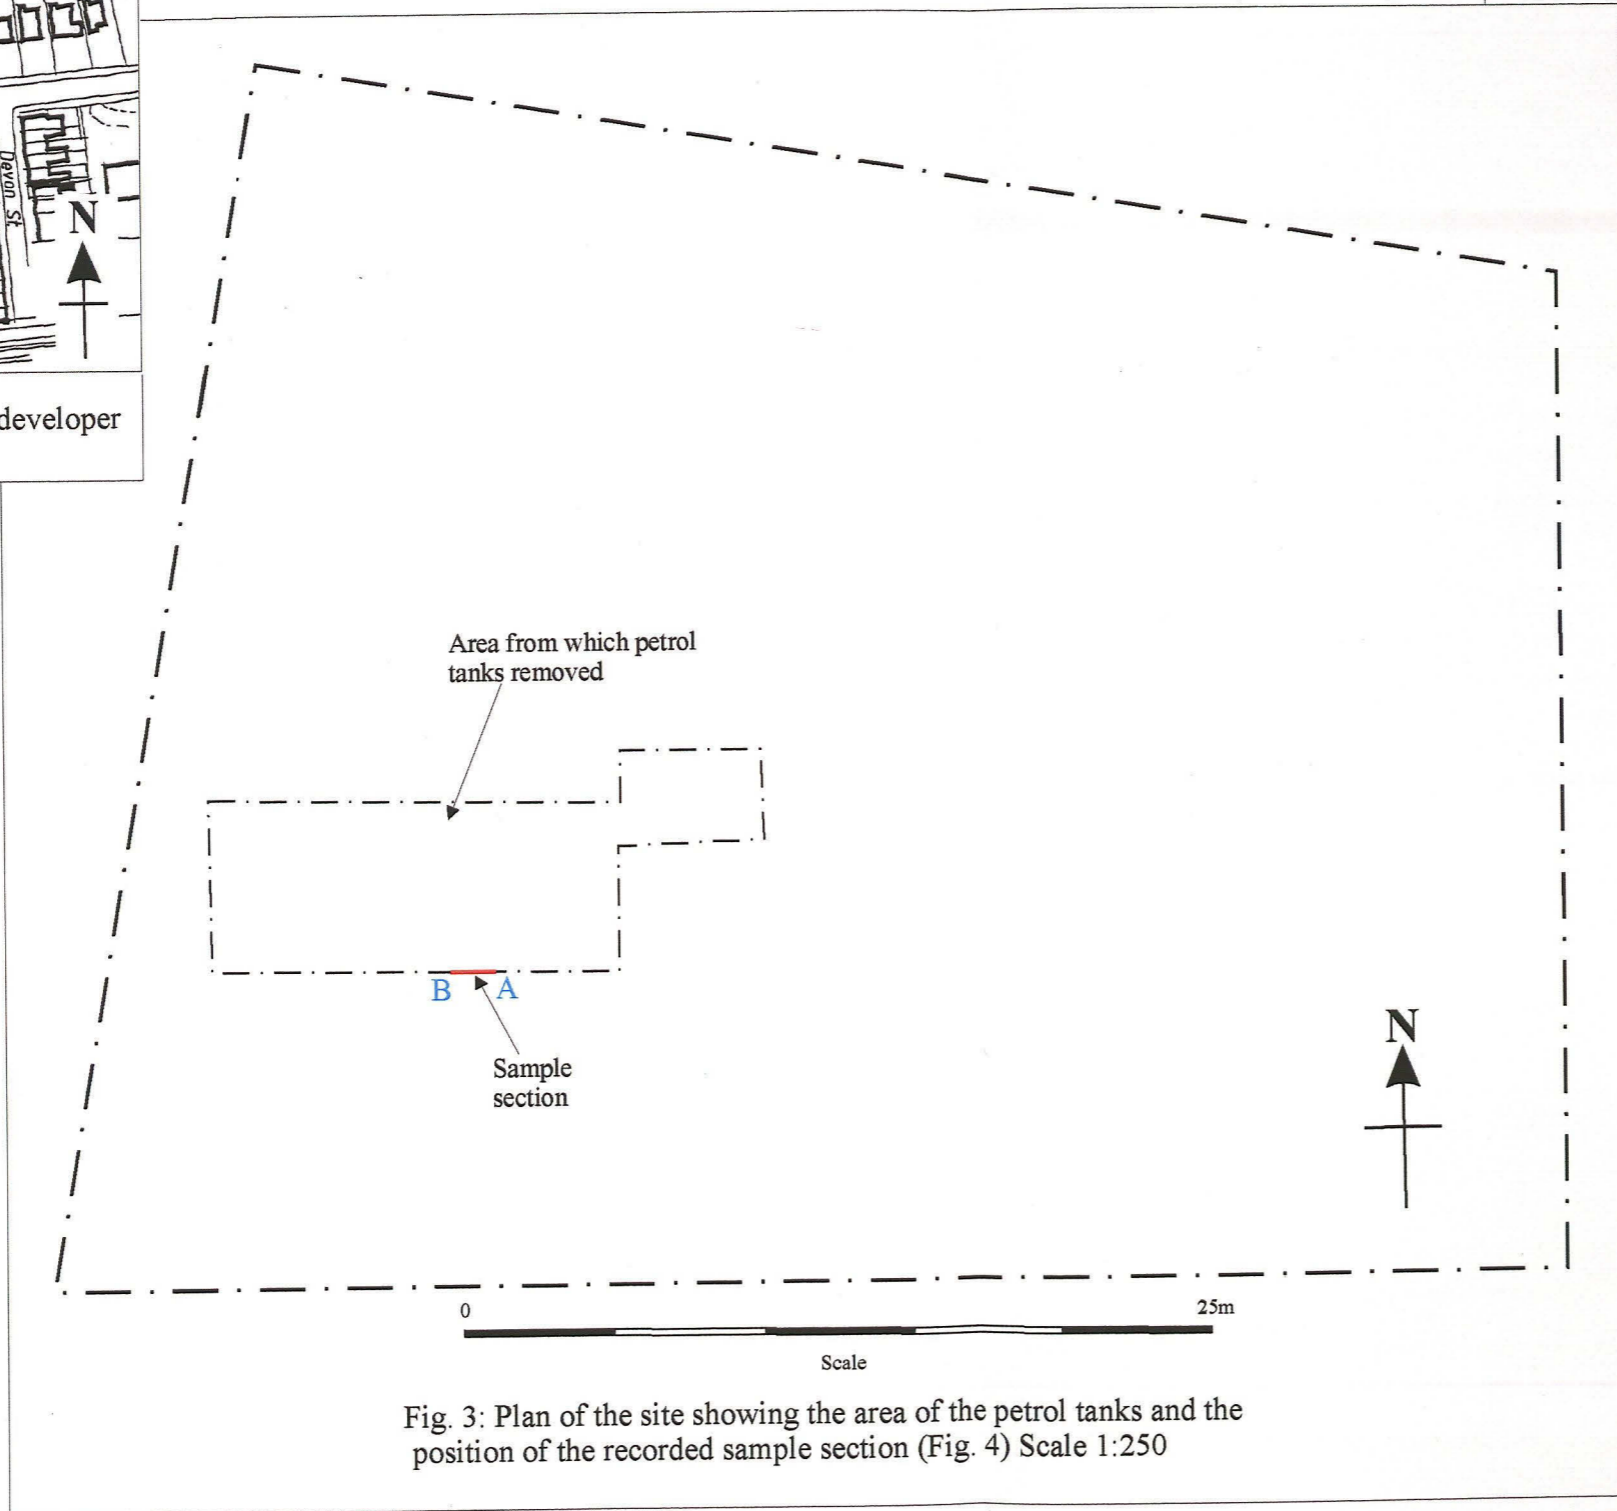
Plan of the site showing the area of the petrol tanks and the position of the recorded sample section (Fig. 4) Scale 1:250
